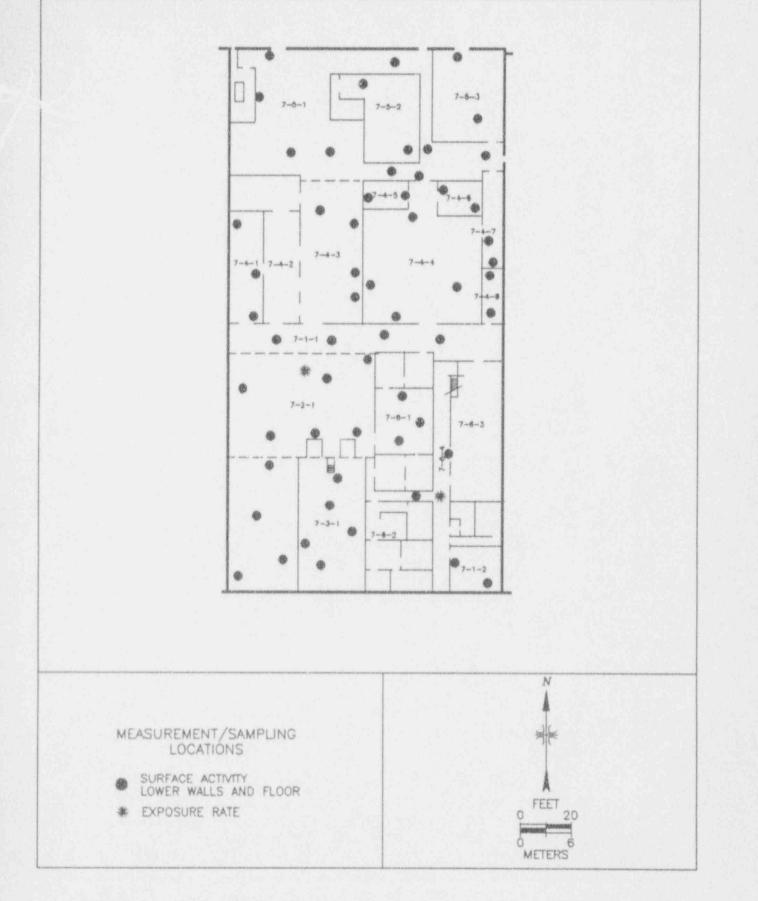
Building 6A, First Floor - Measurement and Sampling Locations
